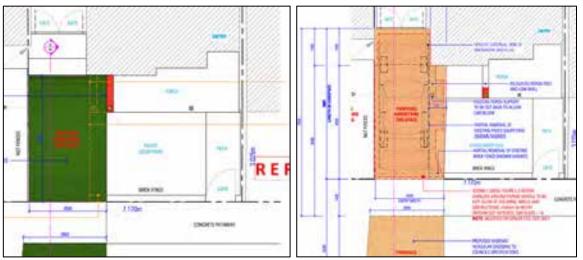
Refused plans under DA-406/2020 (left) and proposed plans under DA-406/2020/1 (right). (Source: ES Design, 2021).
